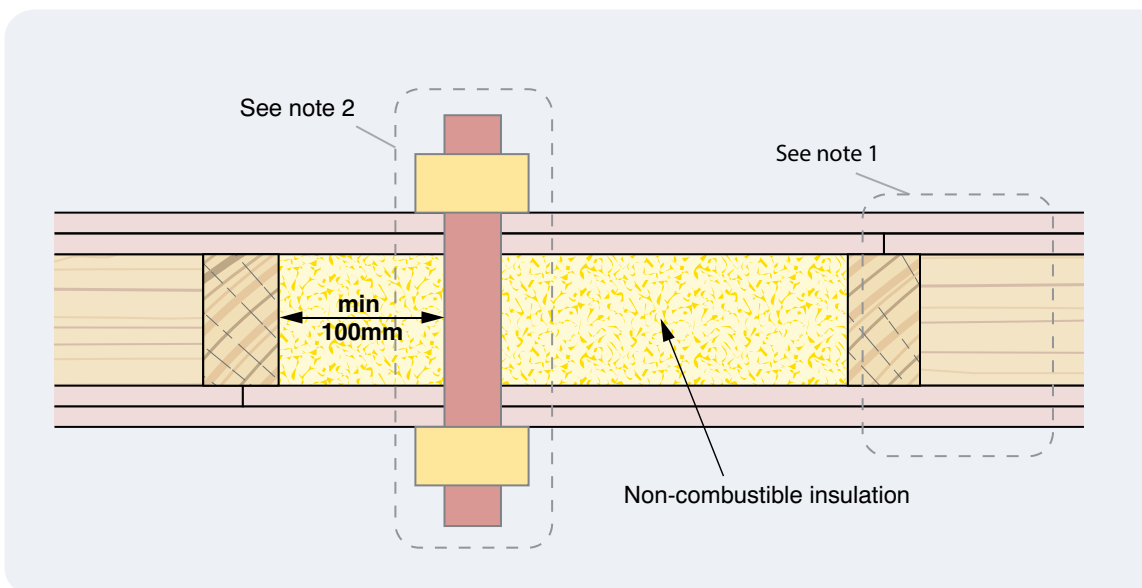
Plastic pipe penetration through fire-protected timber-framed walls with non-combustible mineral fibre insulation.
